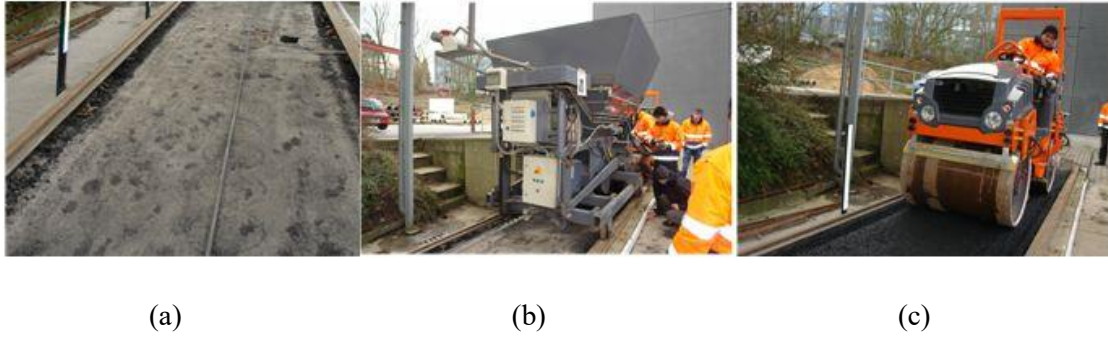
Asphalt mixture paving of test section: (a) test section before asphalt paving; (b) paving of asphalt mixture; (c) compaction of asphalt mixture
